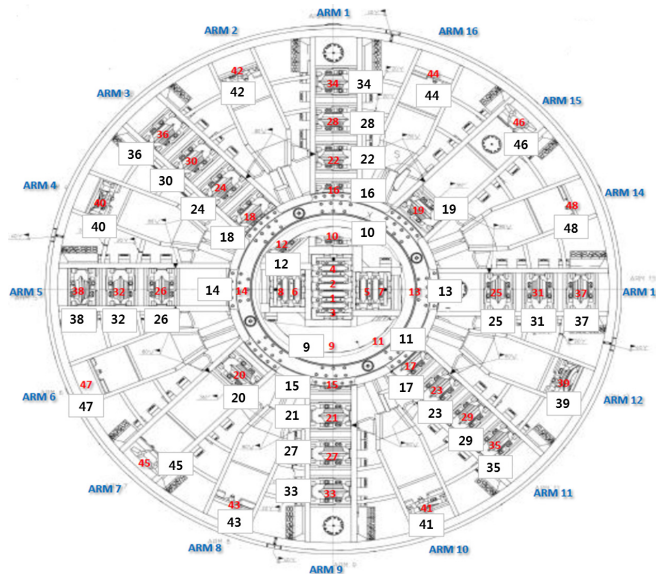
Configuration of shield TBM disc cutters on cutter head
